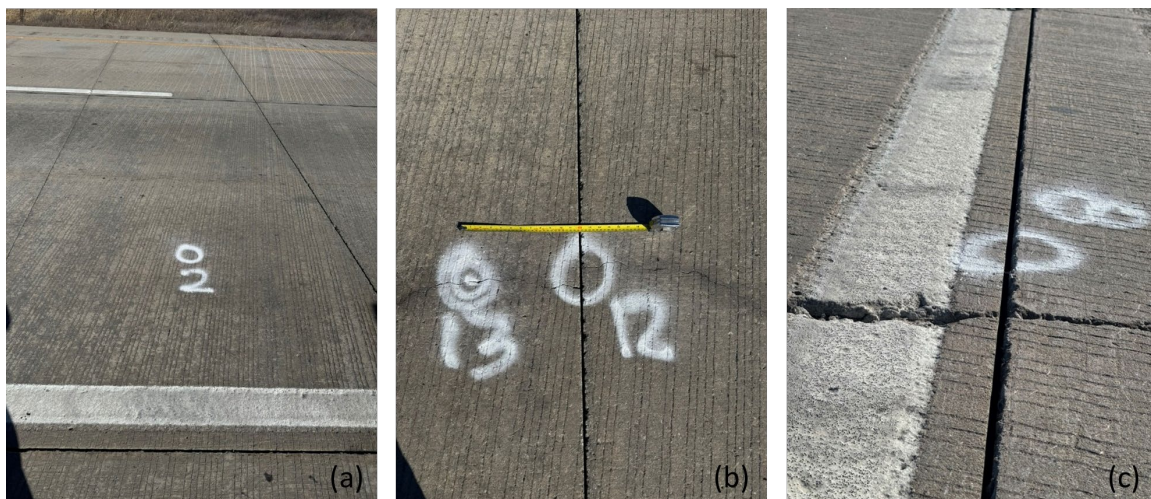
Photos. Example of core location markings at (a) slab center, (b) transverse joint with a longitudinal crack, and (c) over the driving lane-shoulder joint.
